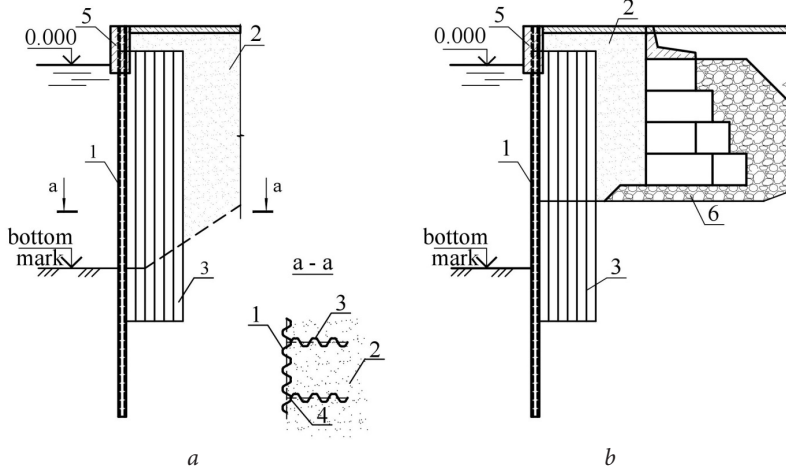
Tongue-and-groove wall with buttresses: a – building a new berth; b – during the berth reconstruction; 1 – front tongue-and-groove wall, 2 – backfill, 3 – transverse rows of piles, 4 – lock joints, 5 – cap beam, 6 – existing design
